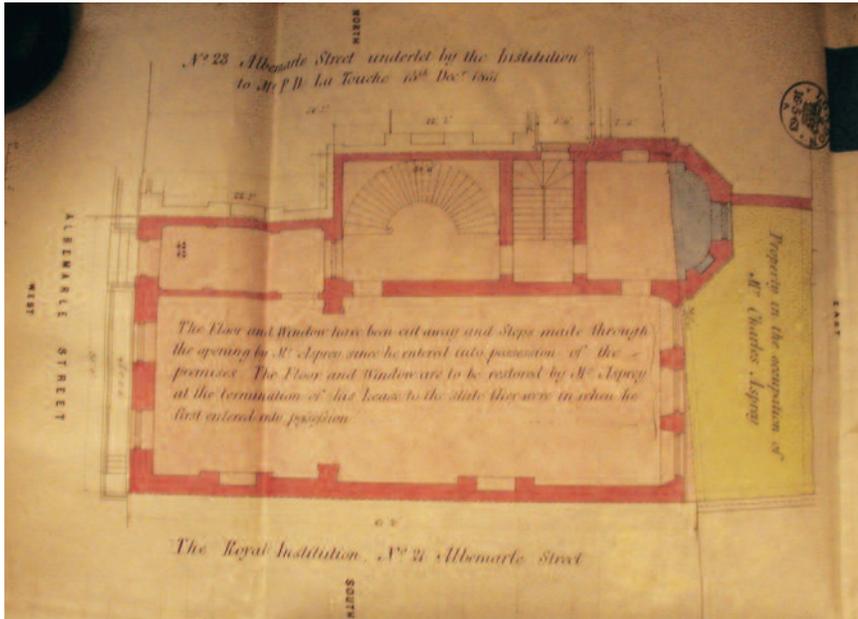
Ground-floor plan of N^o. 22 Albemarle Street, from an 1863 indenture. *Royal Institution, 1,L,9,7. Richard Garnier.
